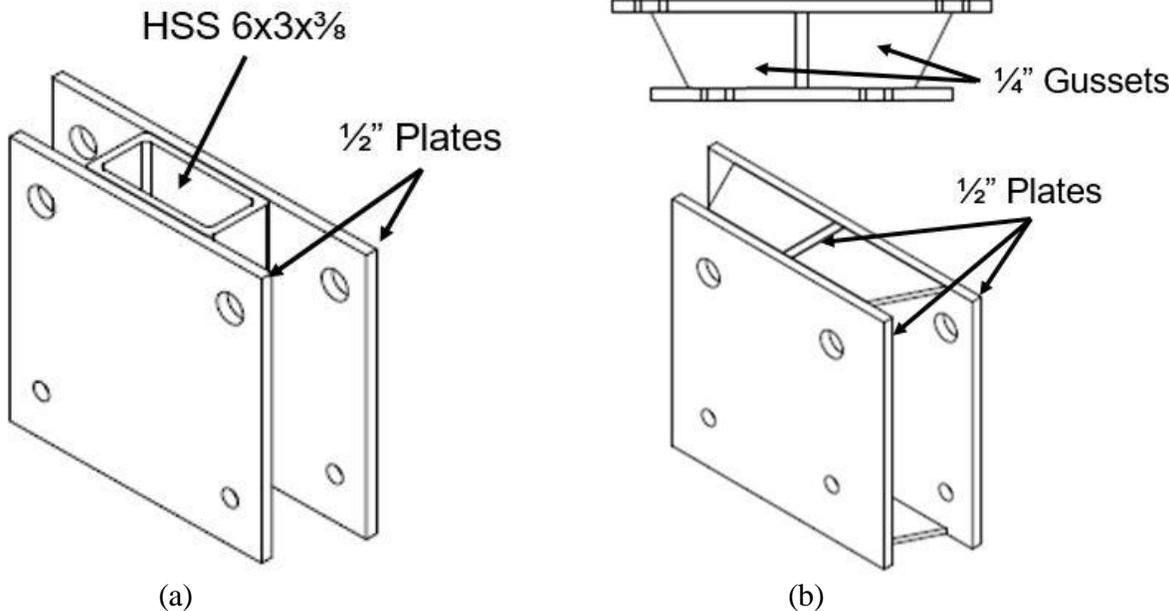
Welded Plate and Spacer Block Spacer Options: (a) Plates and Tube, and (b) Fabricated I-section with Gussets
